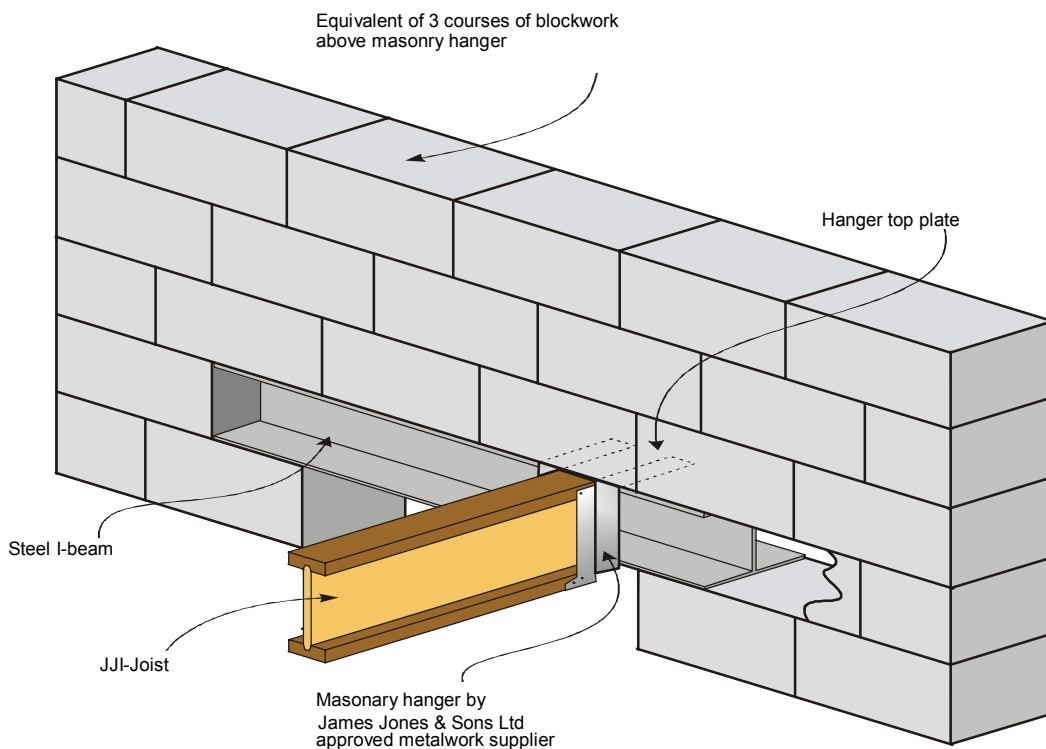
Masonry Hanger to Steel I-Beam Connection (blockwork built-up above steel I-Beam)
